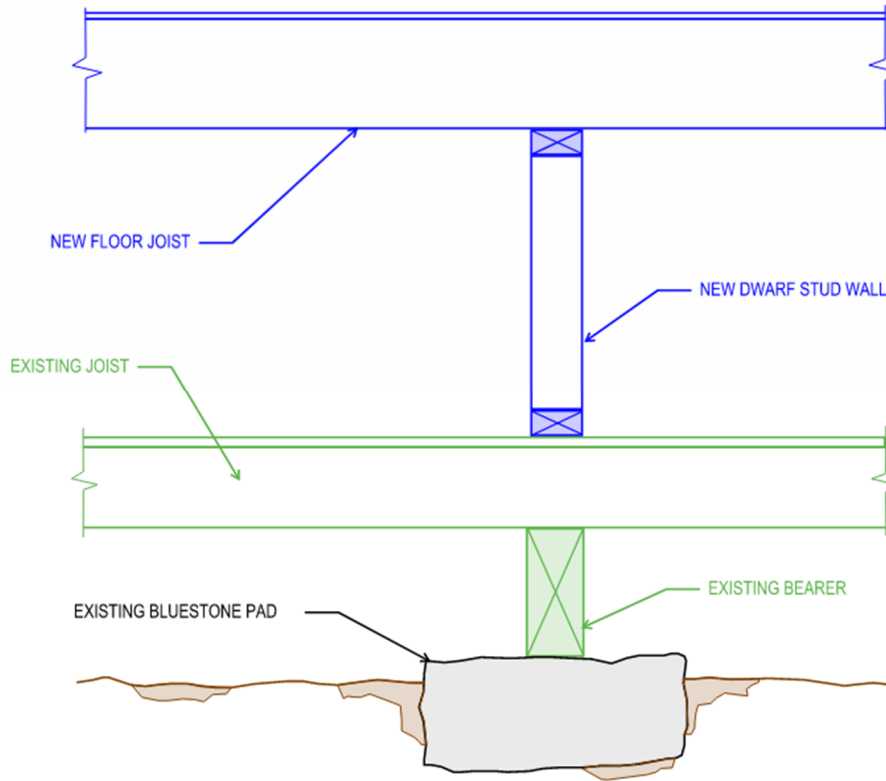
Cross-section view (looking east) of floor build-up to achieve required level
